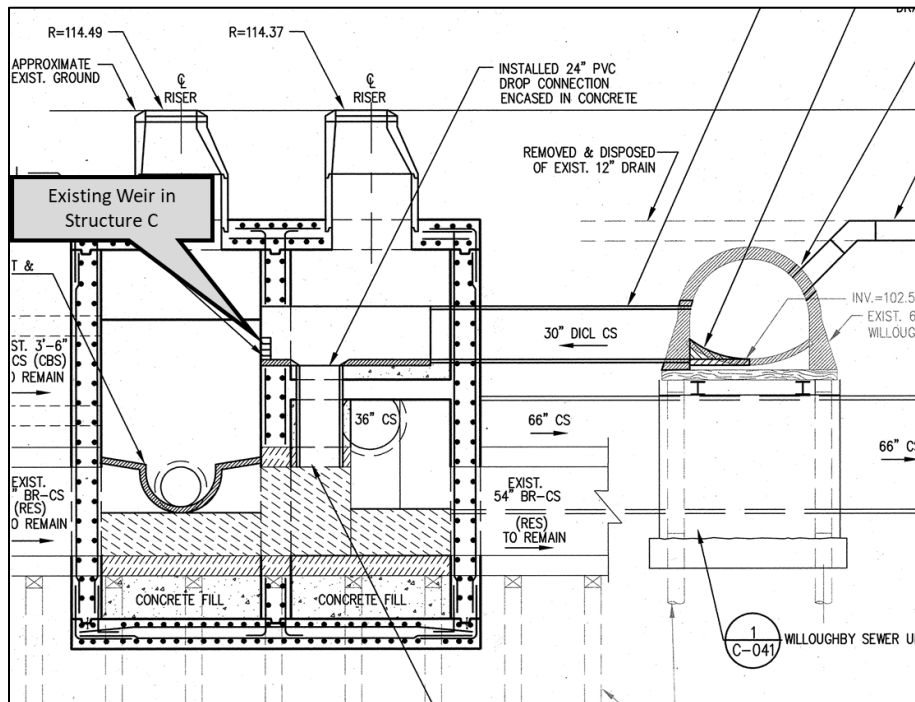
Section View of Structure C Showing Interior Weir (from MWRA Chelsea Branch Sewer Relief Project Drawing No. C-041 Record Drawing)
